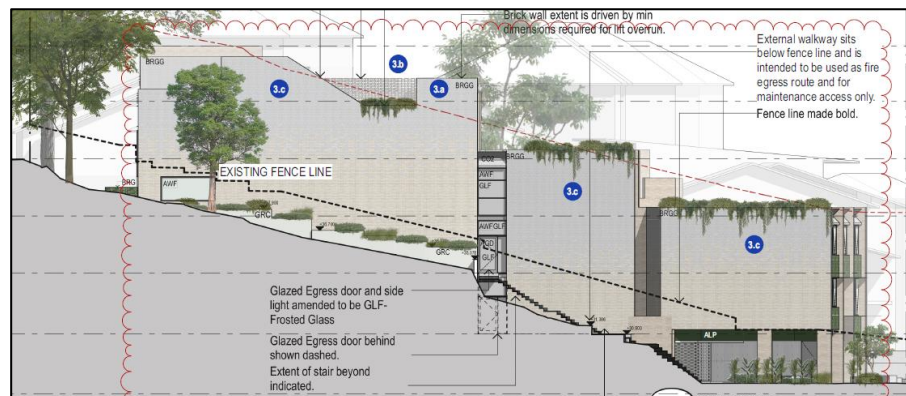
Proposed western elevation (Source: TonkinZulaikhaGreer)
